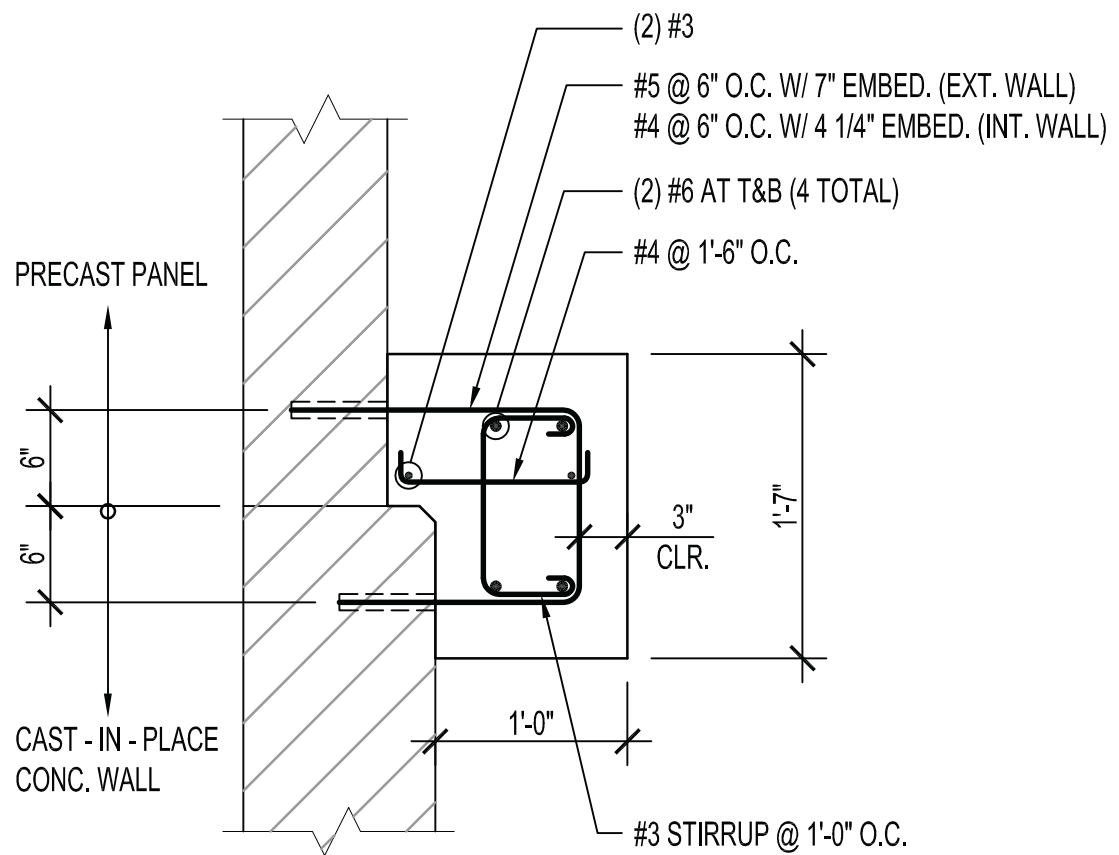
Primary Clarifier 1-4, Precast Panel Base
